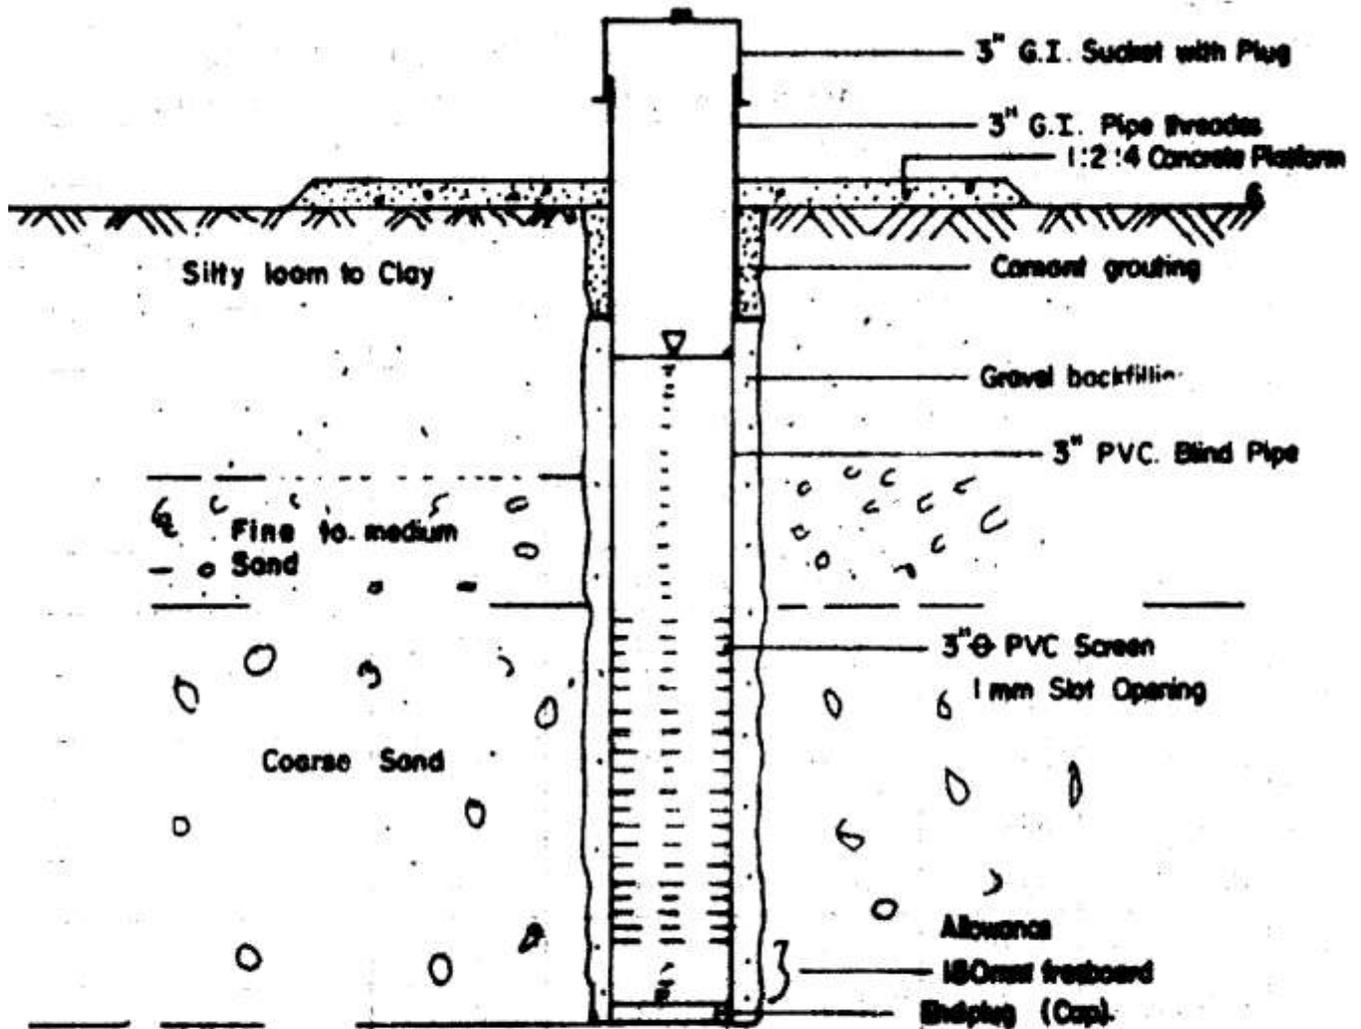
Typical drawing of Tubewell Installation as used in the project area (Not to Scale).
